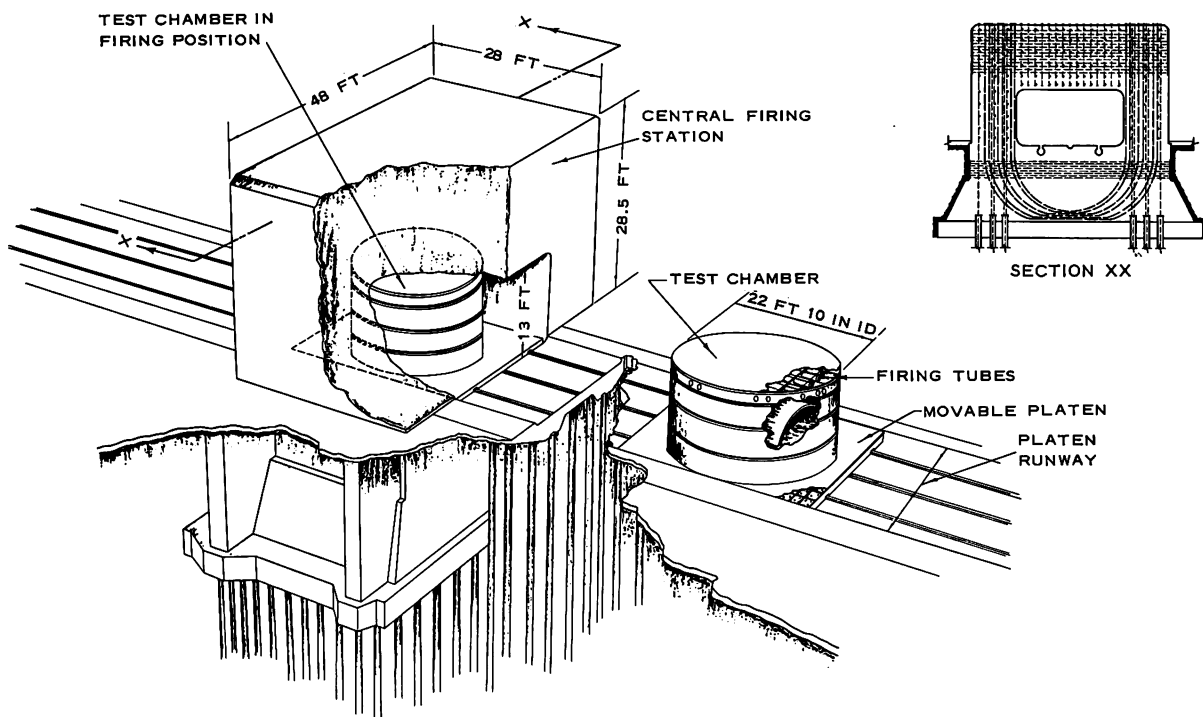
Schematic drawing of large blast load generator central firing station and test chamber
